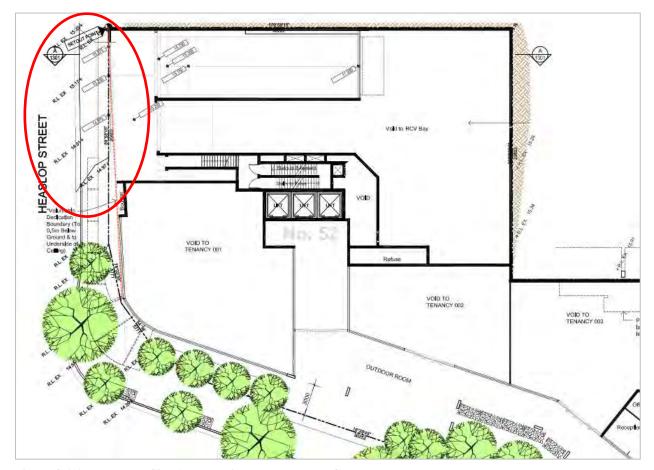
Proposed Site Access Driveway – Heaslop Street
